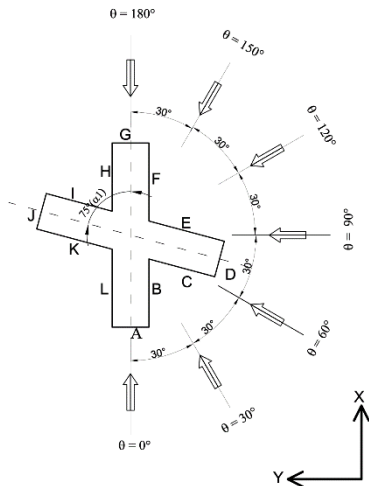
Variation of angle of attack on angular plan shaped building with face notation
